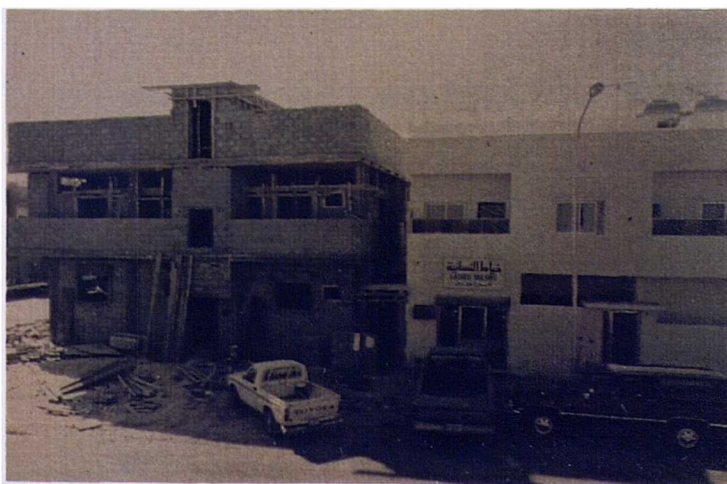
CONVENTIONAL BUILDING MATERIALS IN CONSTRUCTING RESIDENTIAL BUILDINGS IN DAMMAM REGION.
